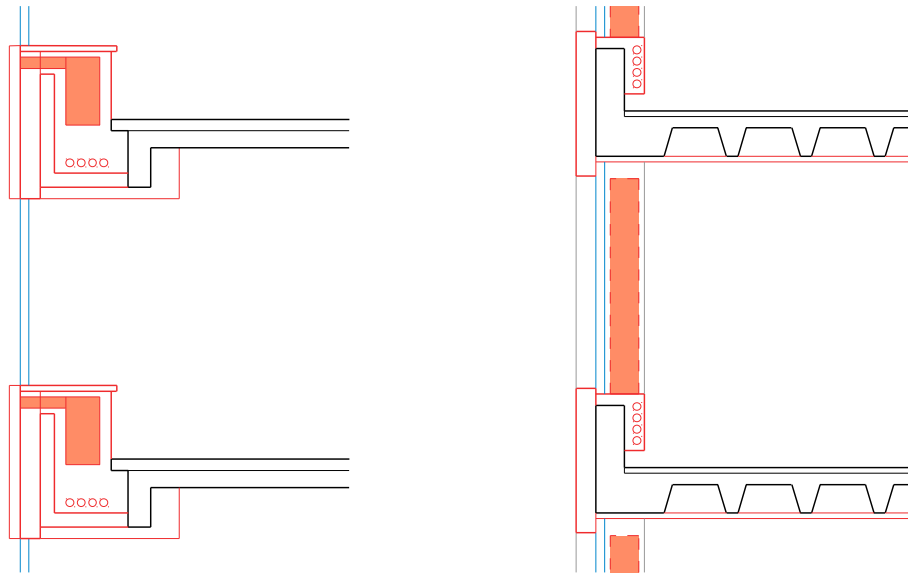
Façade sections of two refurbishment projects (new structures in red) (after Trox Lighttower, 2006 and Trox Feldbergstraße, 2009)
